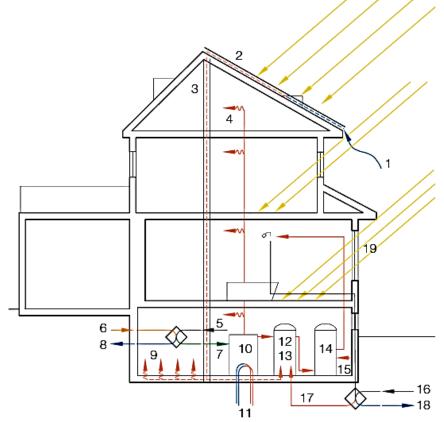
Cross-section showing building technical services concept, scale 1:250 (Voss et al., 2013)
